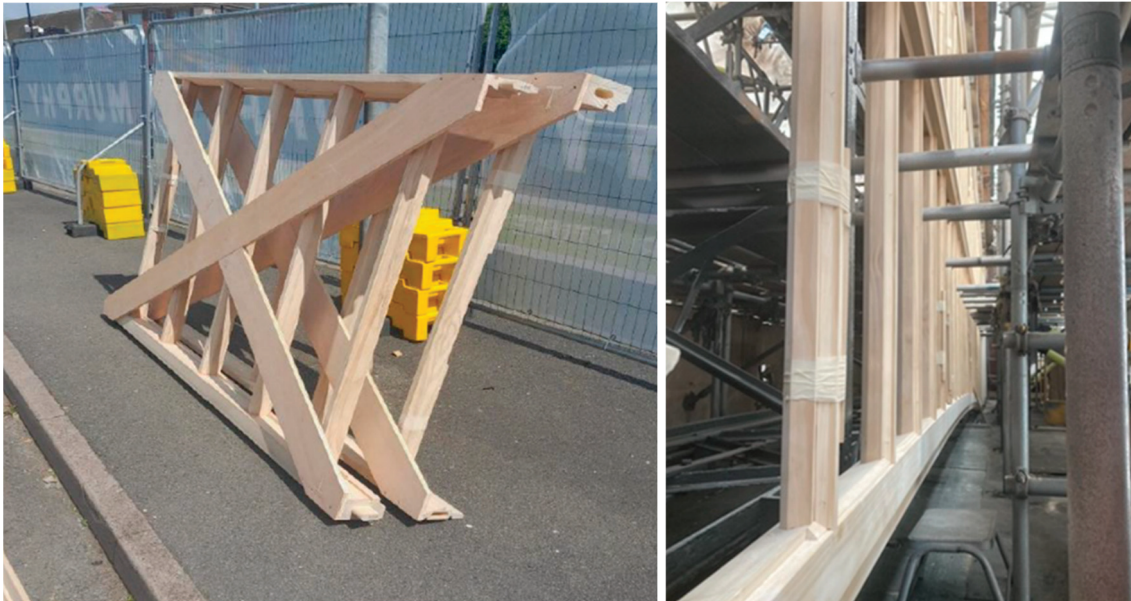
The sections of the Accoya® frame and the new wood frame under construction.
